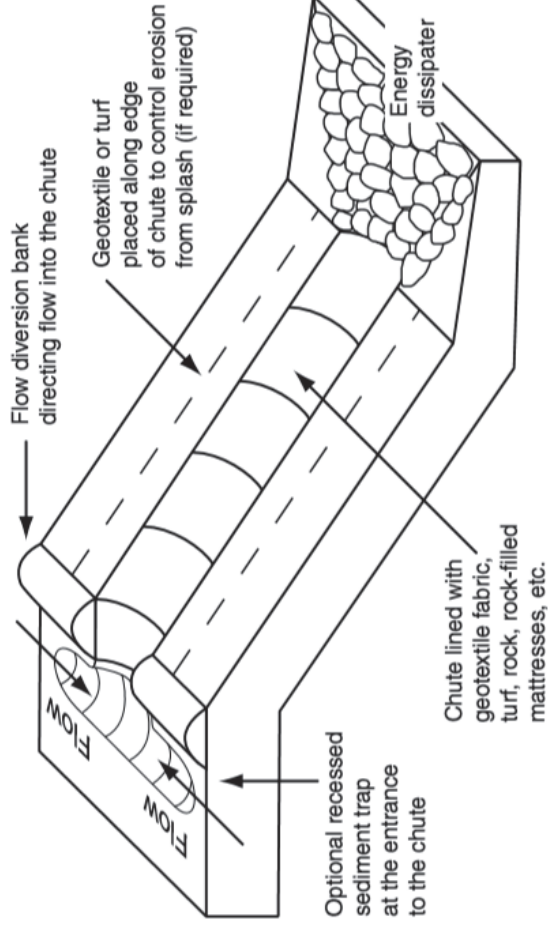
Typical Drainage Chute Detail (IECA 2018)
